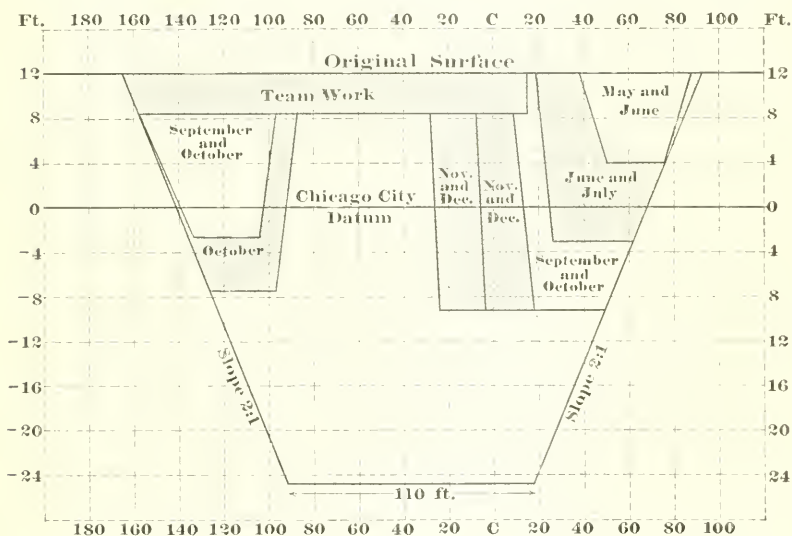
TYPICAL CROSS-SECTION SHOWING PROGRESS OF WORK TO DECEMBER 31, 1894. SECTION M.
